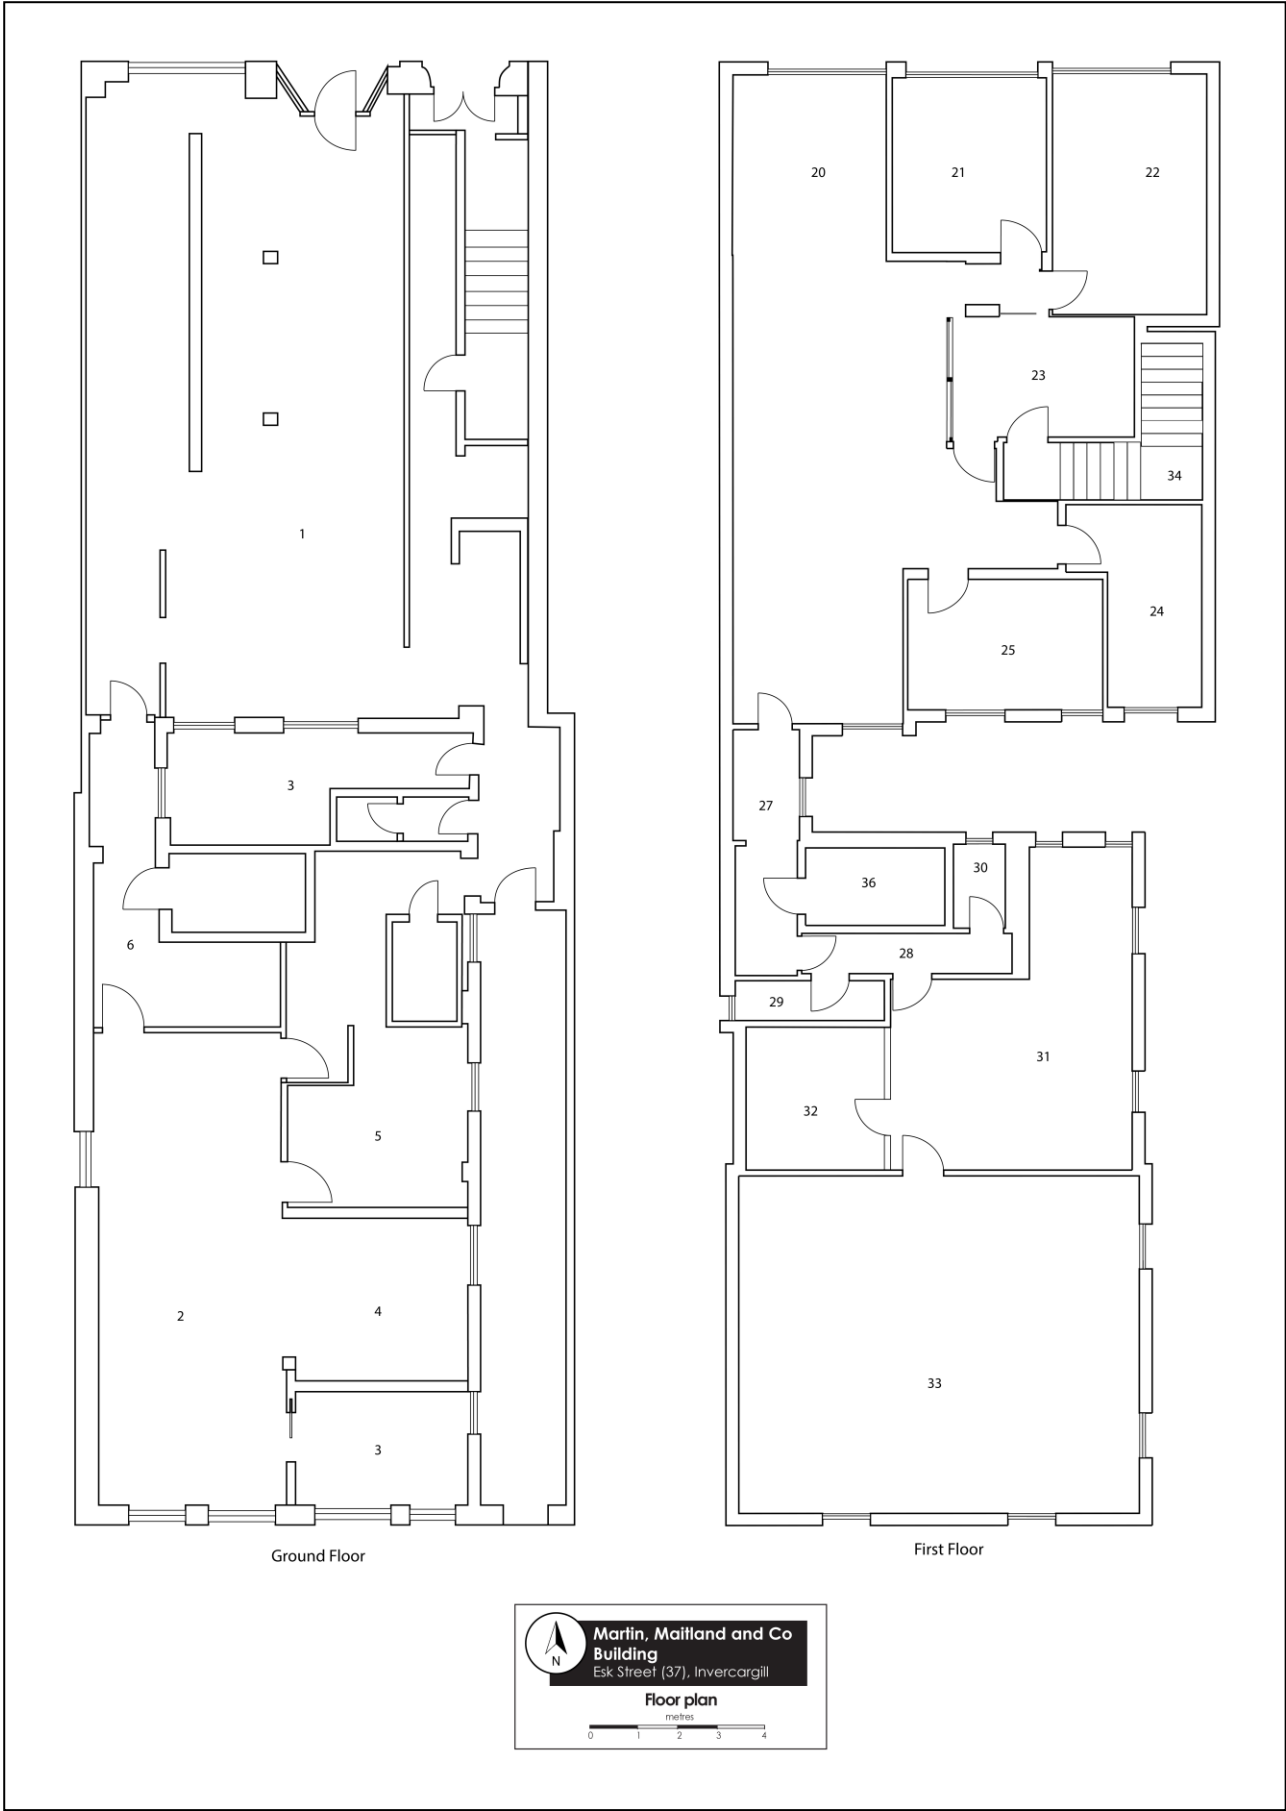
Ground (left) and first (right) floor plans of Martin, Maitland and Co.'s Building.
